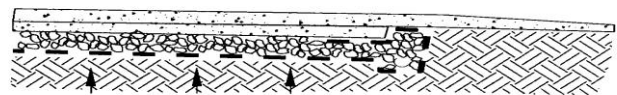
Filters beneath pavement permeable bases, blanket drains and base courses. (Prefabricated geocomposite drains are also used as horizontal drains in pavement systems.)
